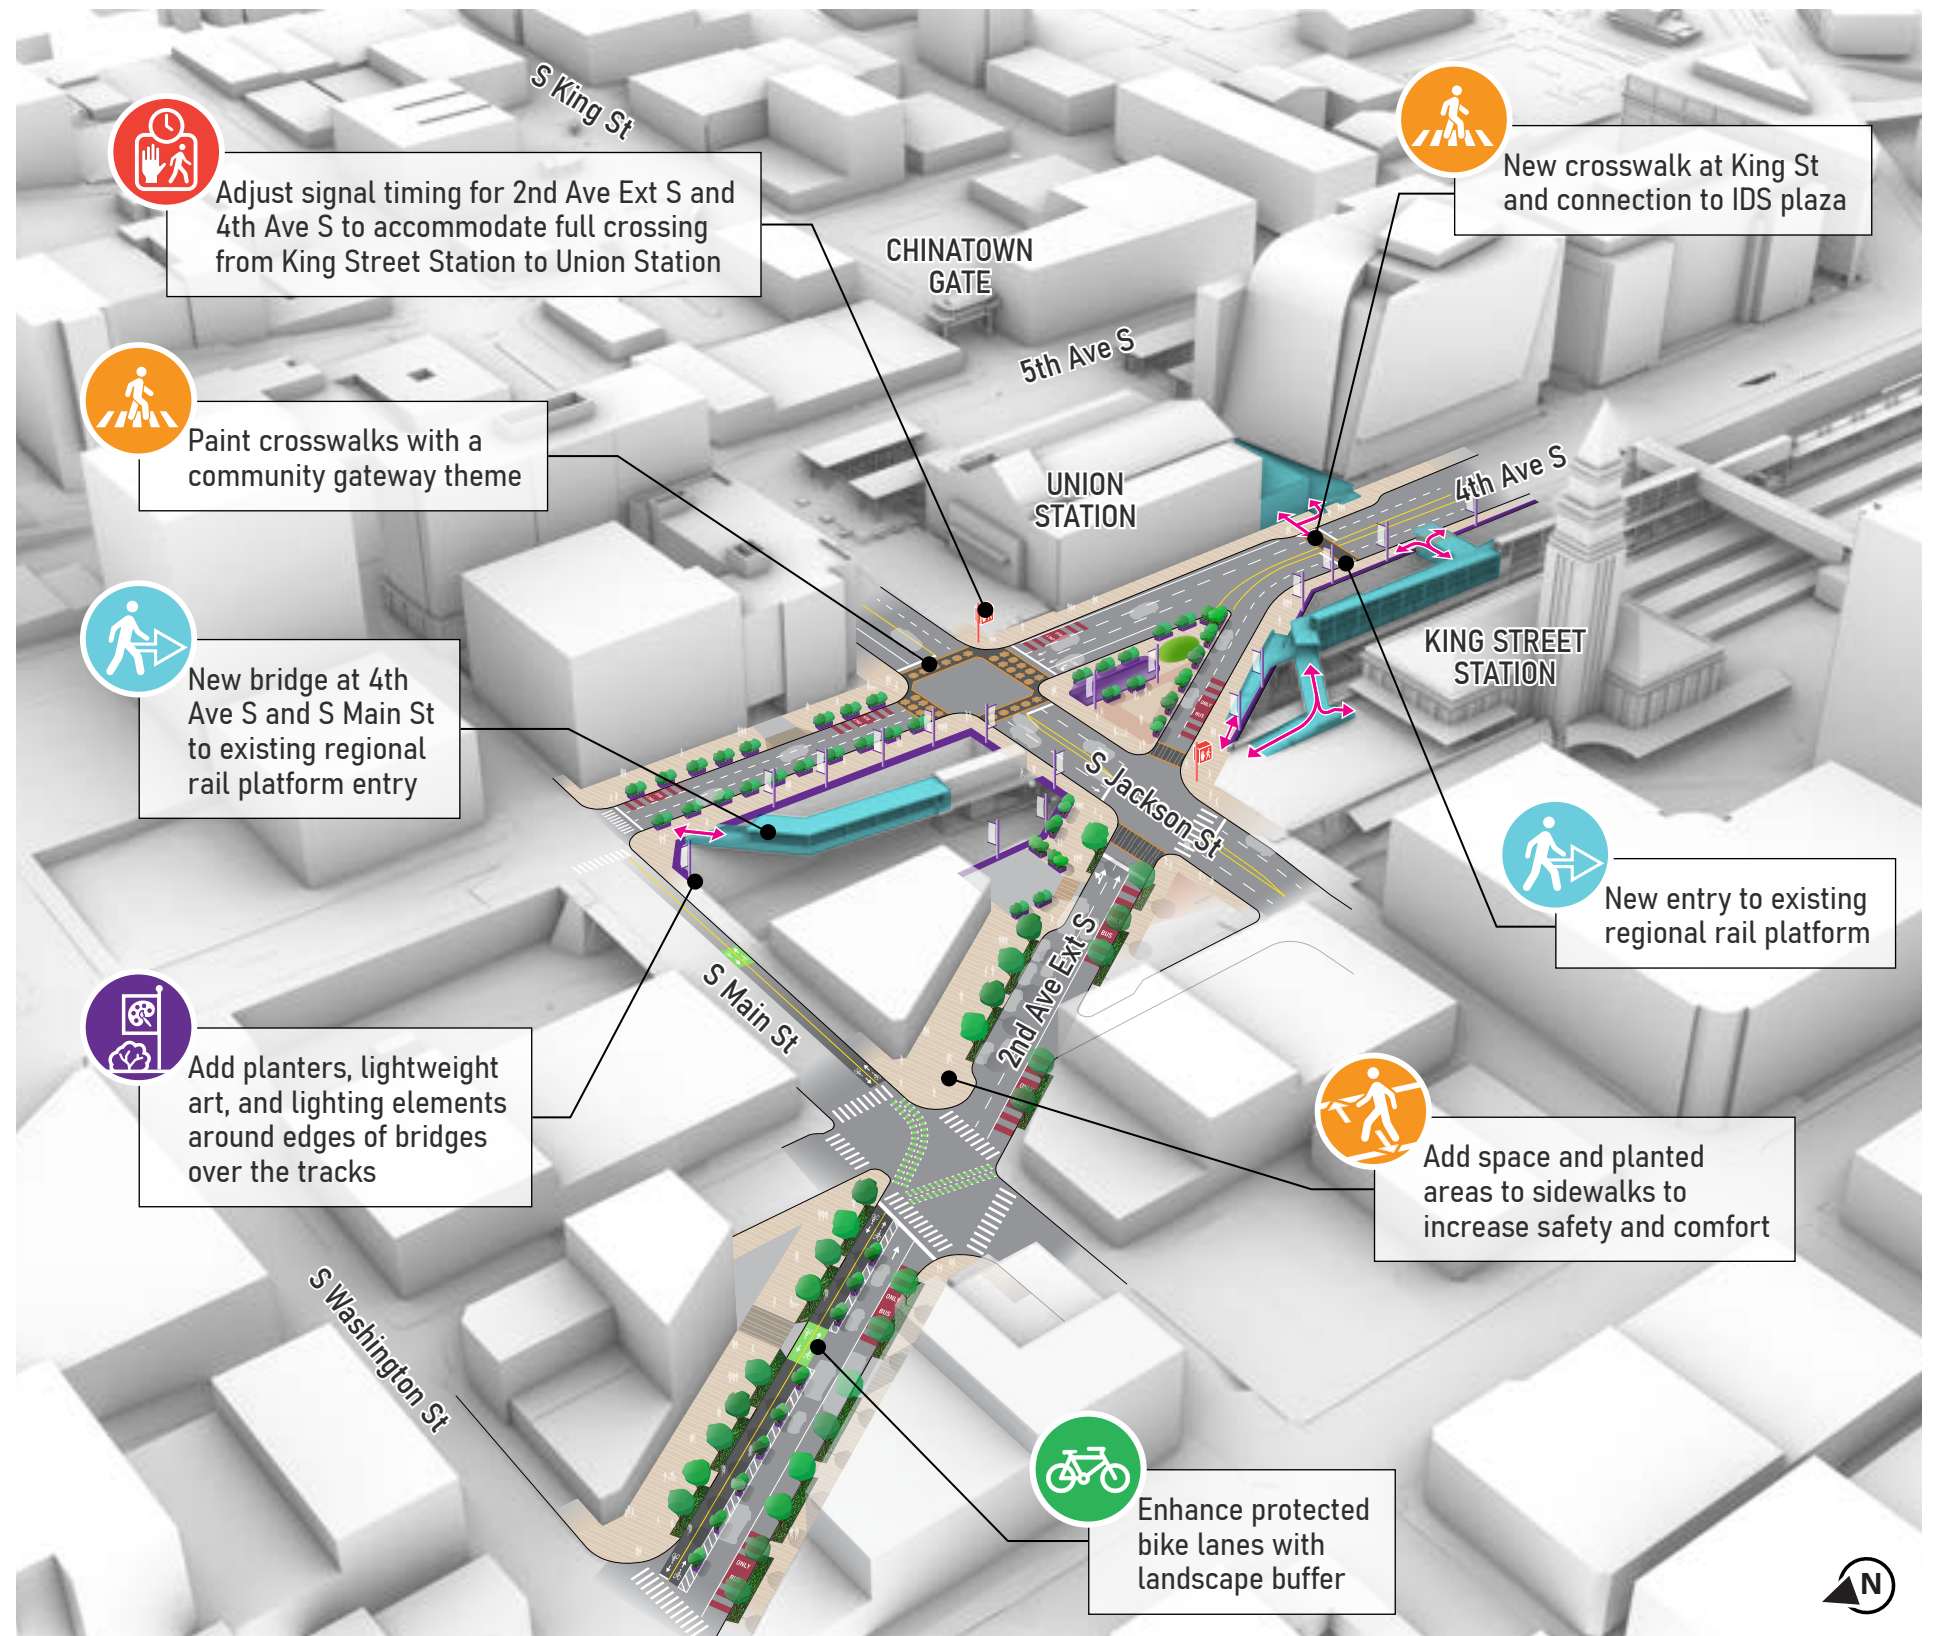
Stitch Focus Area Improvements Overview. Illustration looking southeast toward the intersection of 4th Ave S and 2nd Ave Ext S showing potential improvements. Note: Details of design and implementation subject to ongoing coordination with 2nd Ave Ext S and S Jackson St Bridge Study.
